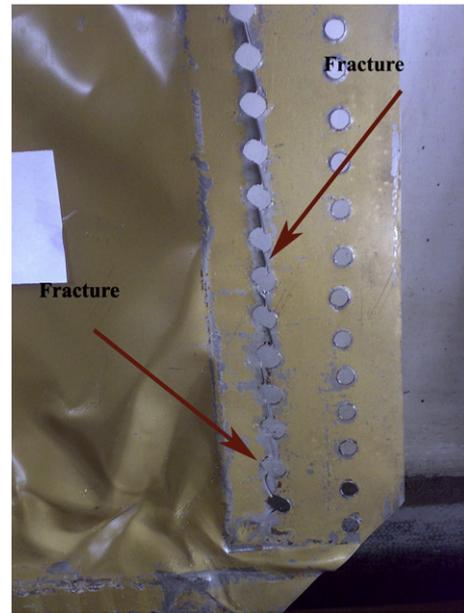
Bearing failure in the line of bolts in the SPW1 specimen.
